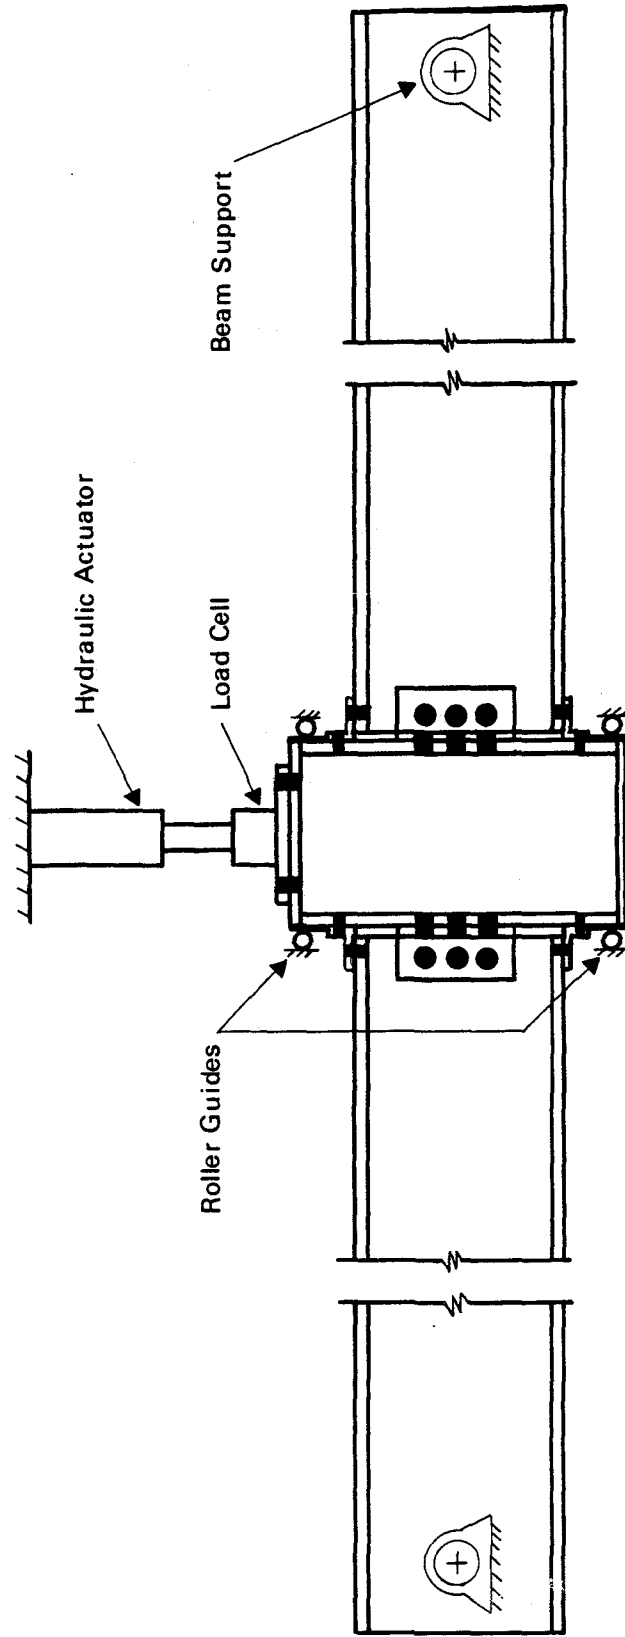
SCHEMATIC OF LOADING SYSTEM FOR TEST BEAMS
